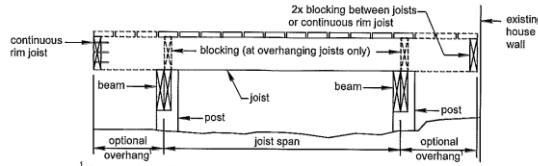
JOISTS WITH TWO DROPPED BEAMS/FREE-STANDING DECK
